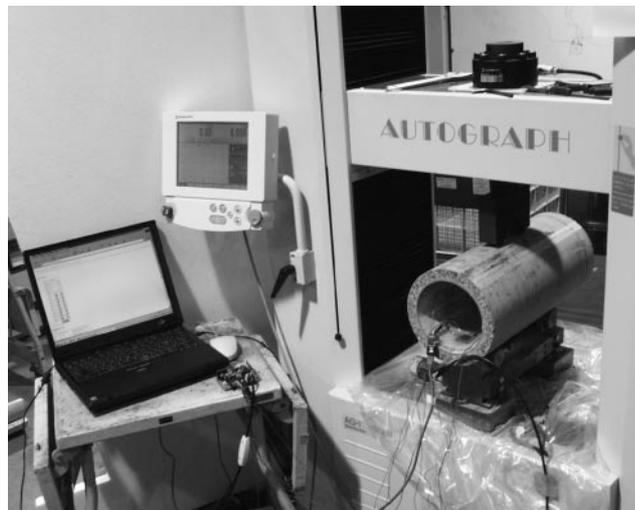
Experimental setup of demonstration test of fracture monitoring of sewer pipe.
